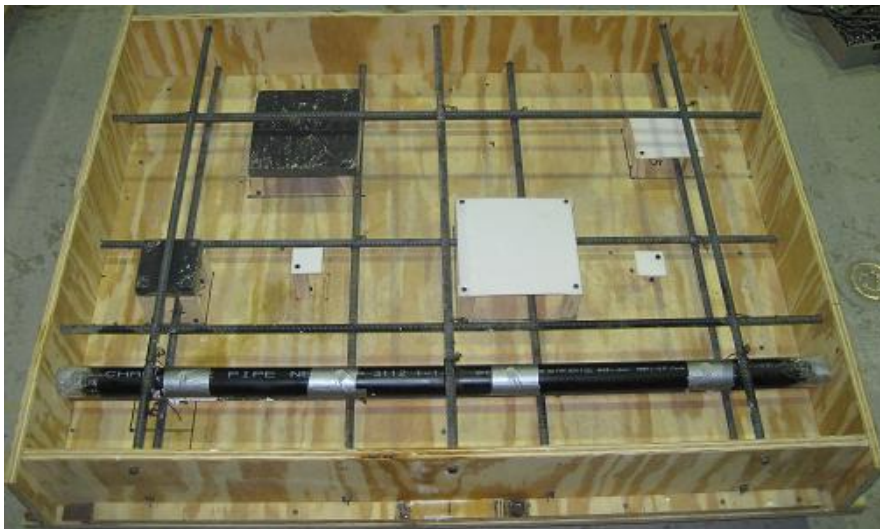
Photo of the formwork of the concrete slab with defects before casting
